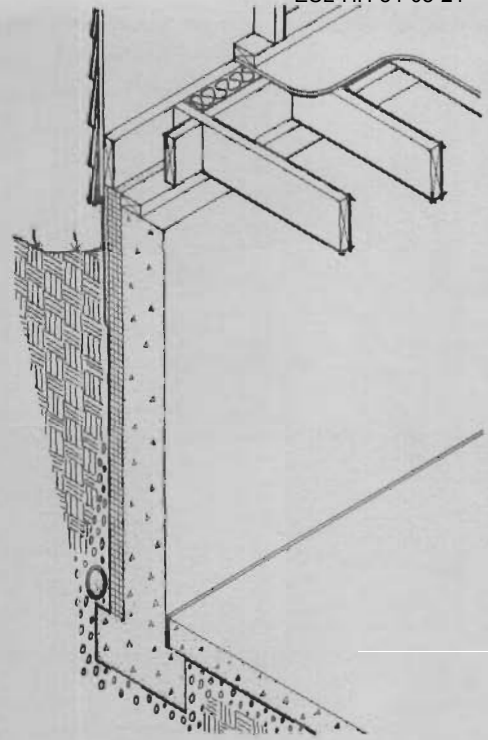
"AFFORDABLE HOUSING THROUGH ENERGY CONSERVATION"; FOUNDATION DETAIL
